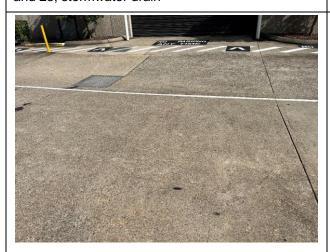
Adjacent entrace to carpark, units 17, 18 and 23, unknown pit
